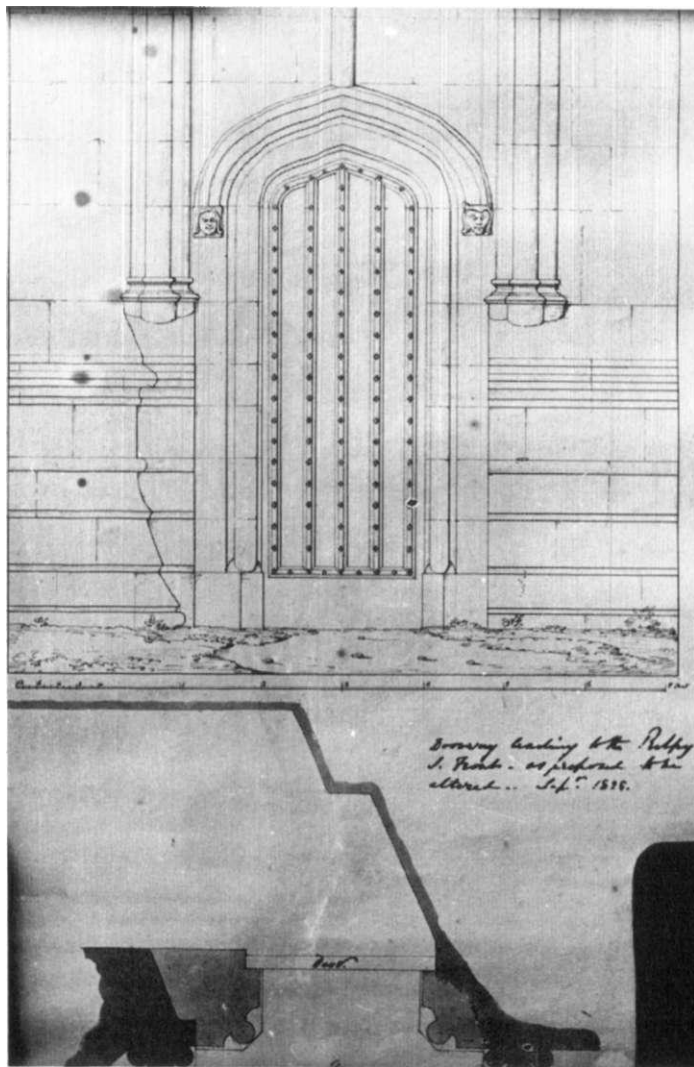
(b) South Doorway to South-West Tower, as proposed by Joseph Potter, sen., 1828. (L.J.R.O.)
